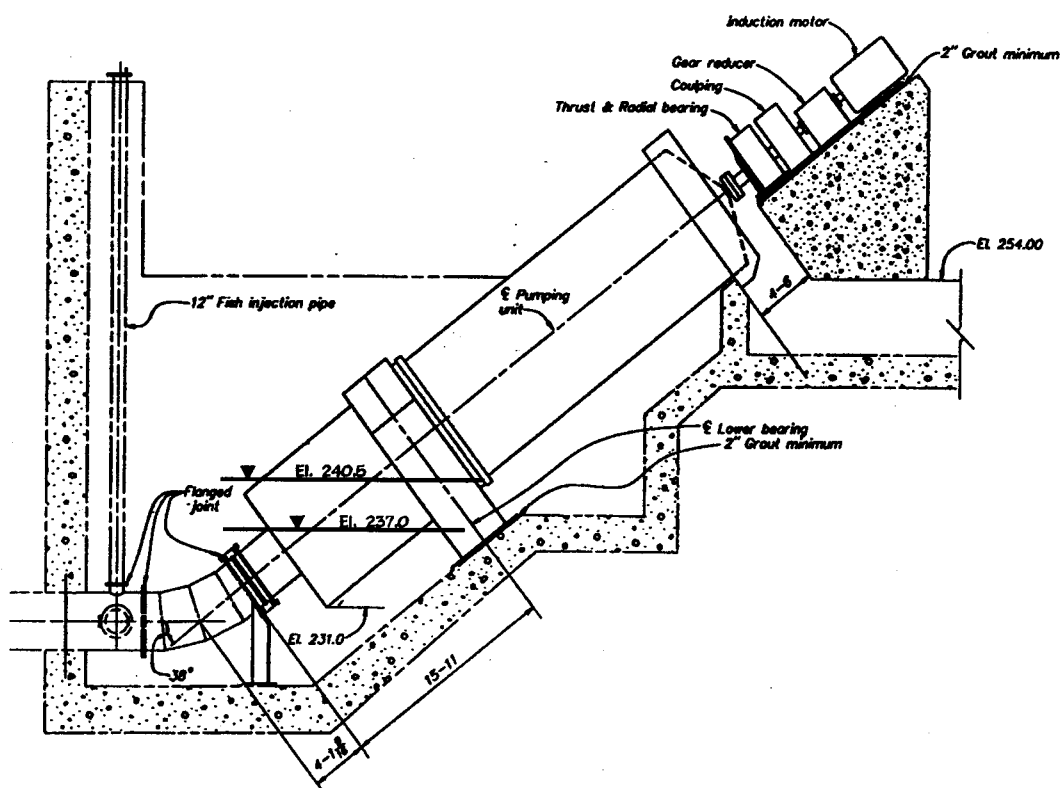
Elevation setting of the Internallift Archimedes pumps. *Design settings for the Archimedes pumps at RBRPP. Note specified minimum and maximum water surface elevations for pumping, actual maximum was actually closer to 245.
